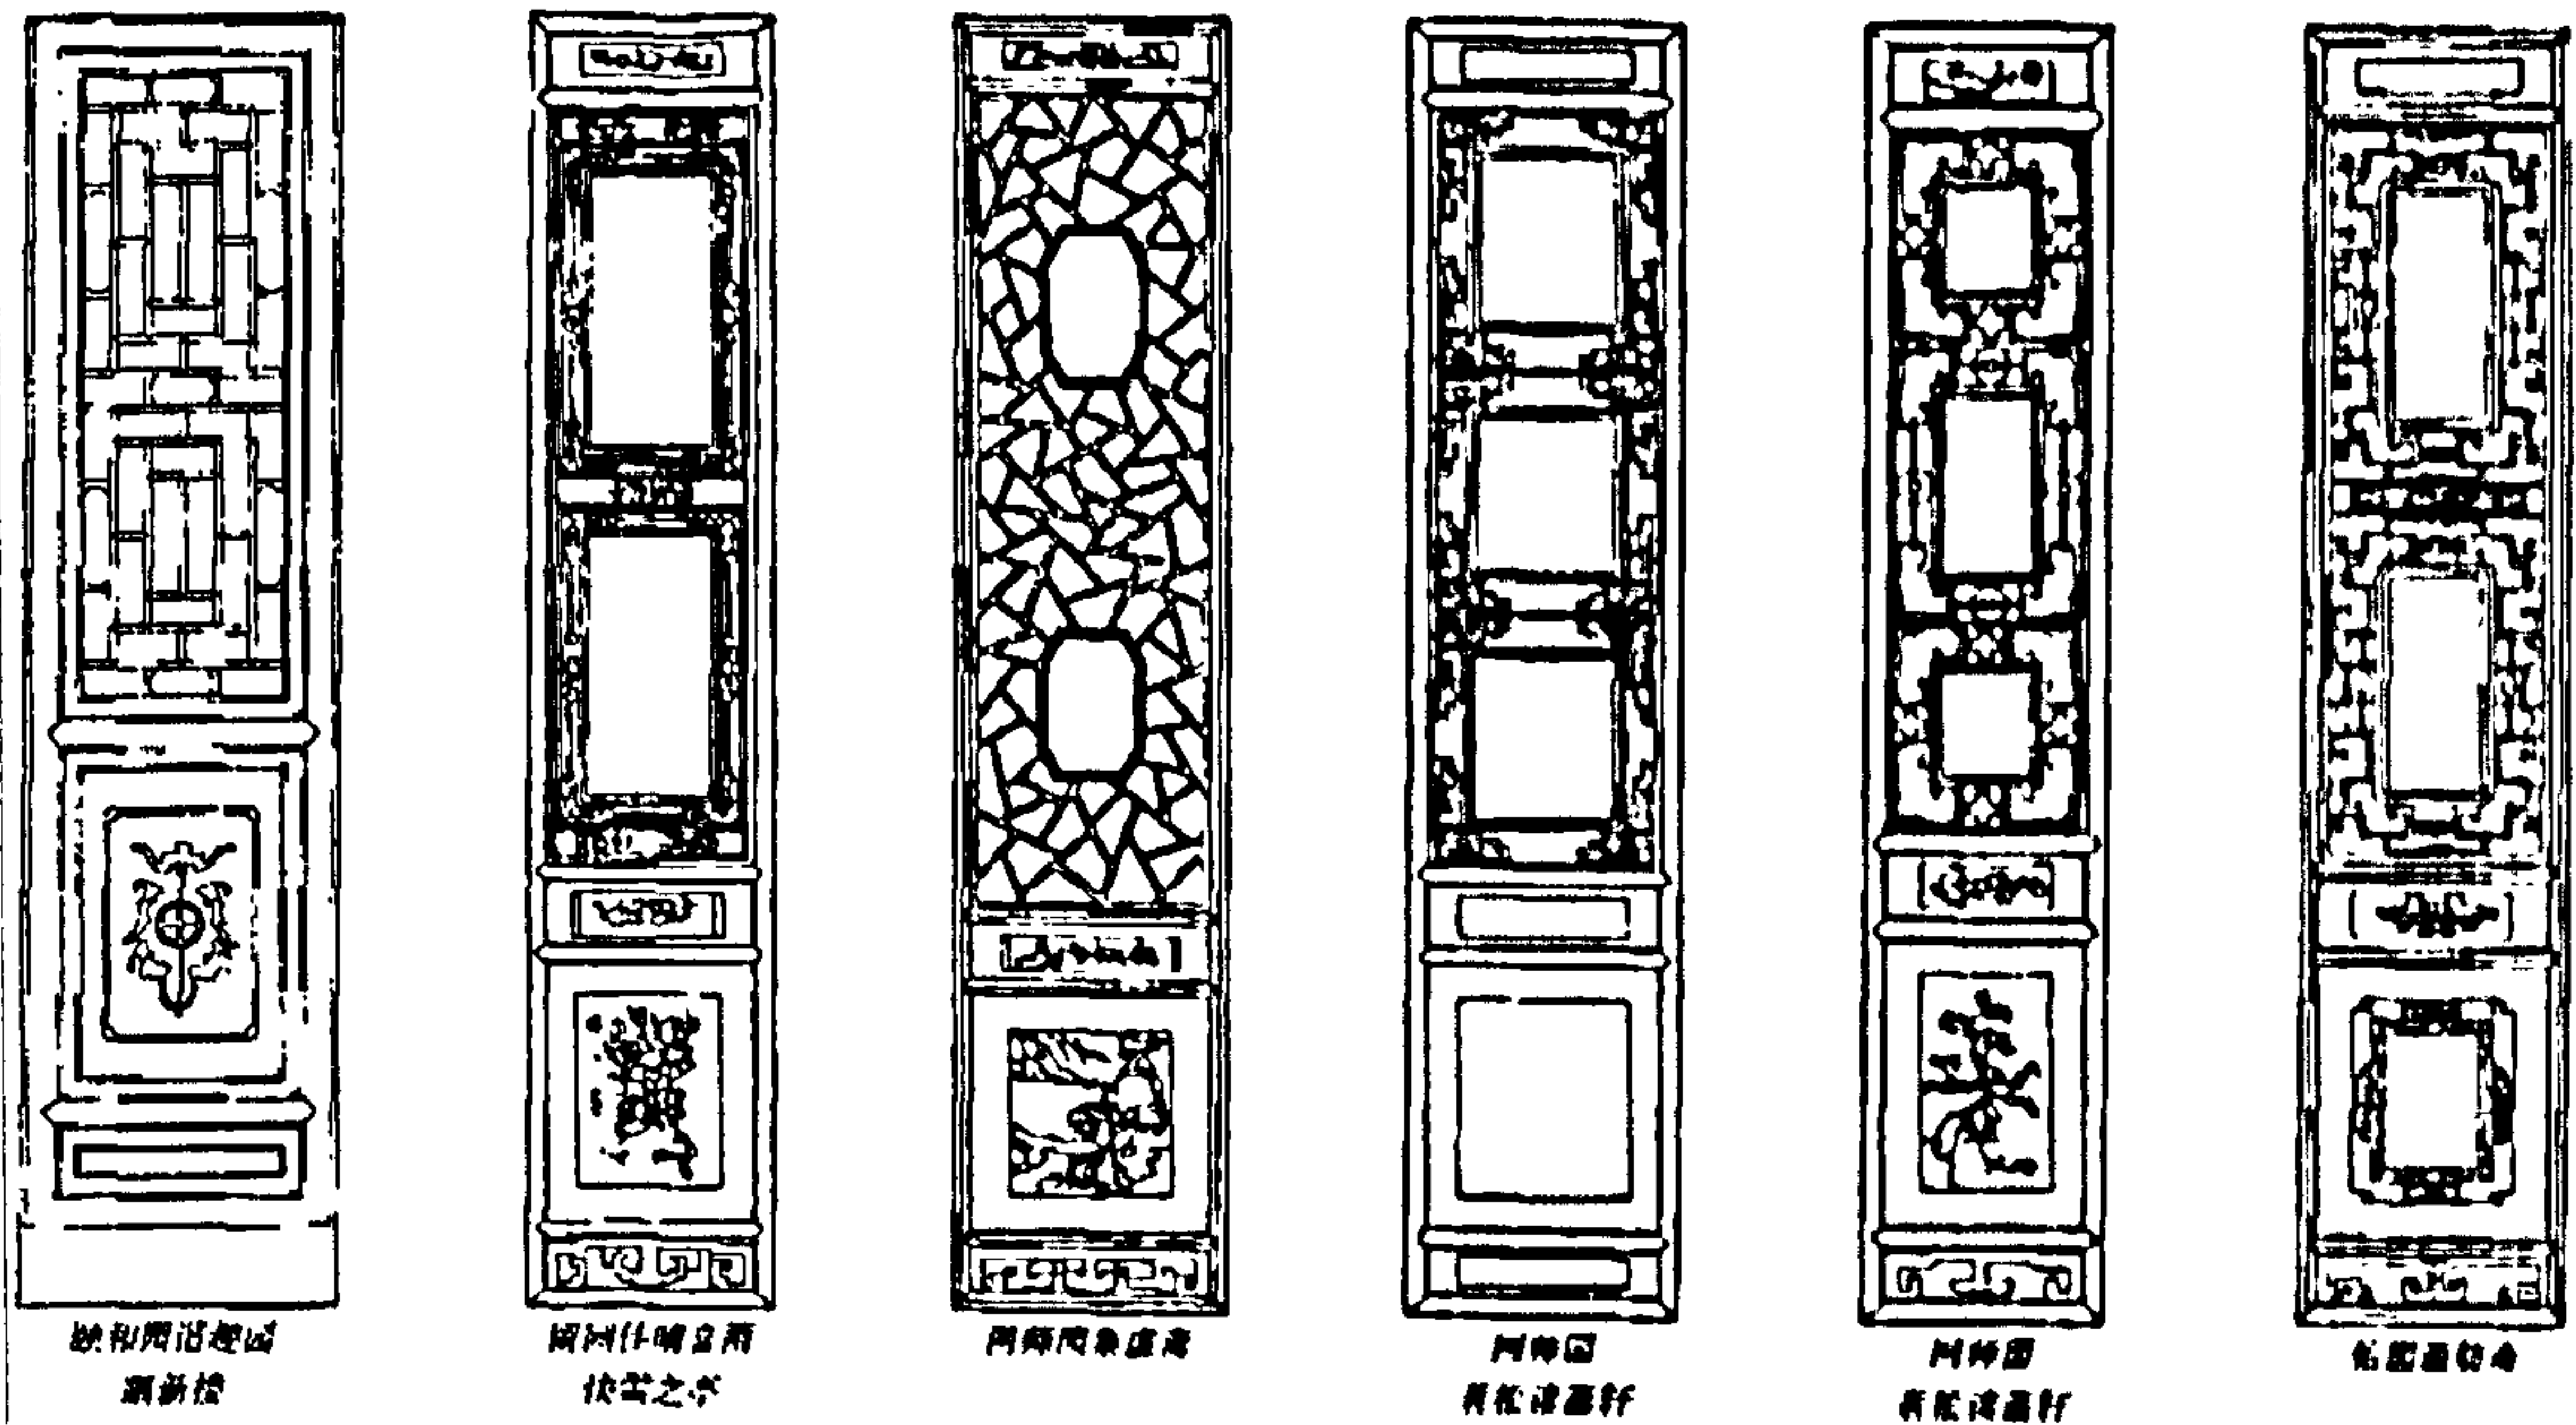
The Pattern of Doors in Jiang Nan Garden
